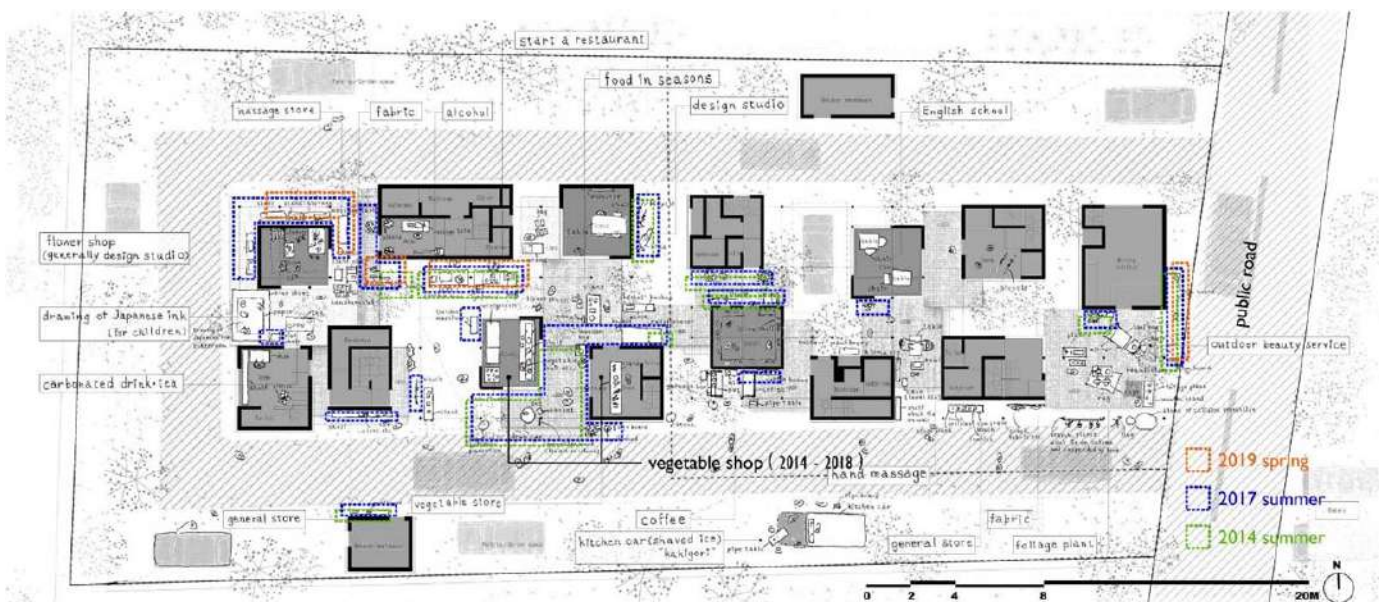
Transition of the Privately Used Area *Afuredashi* (2014, 2017, 2019) floor plan (Source: Author, 2019)
